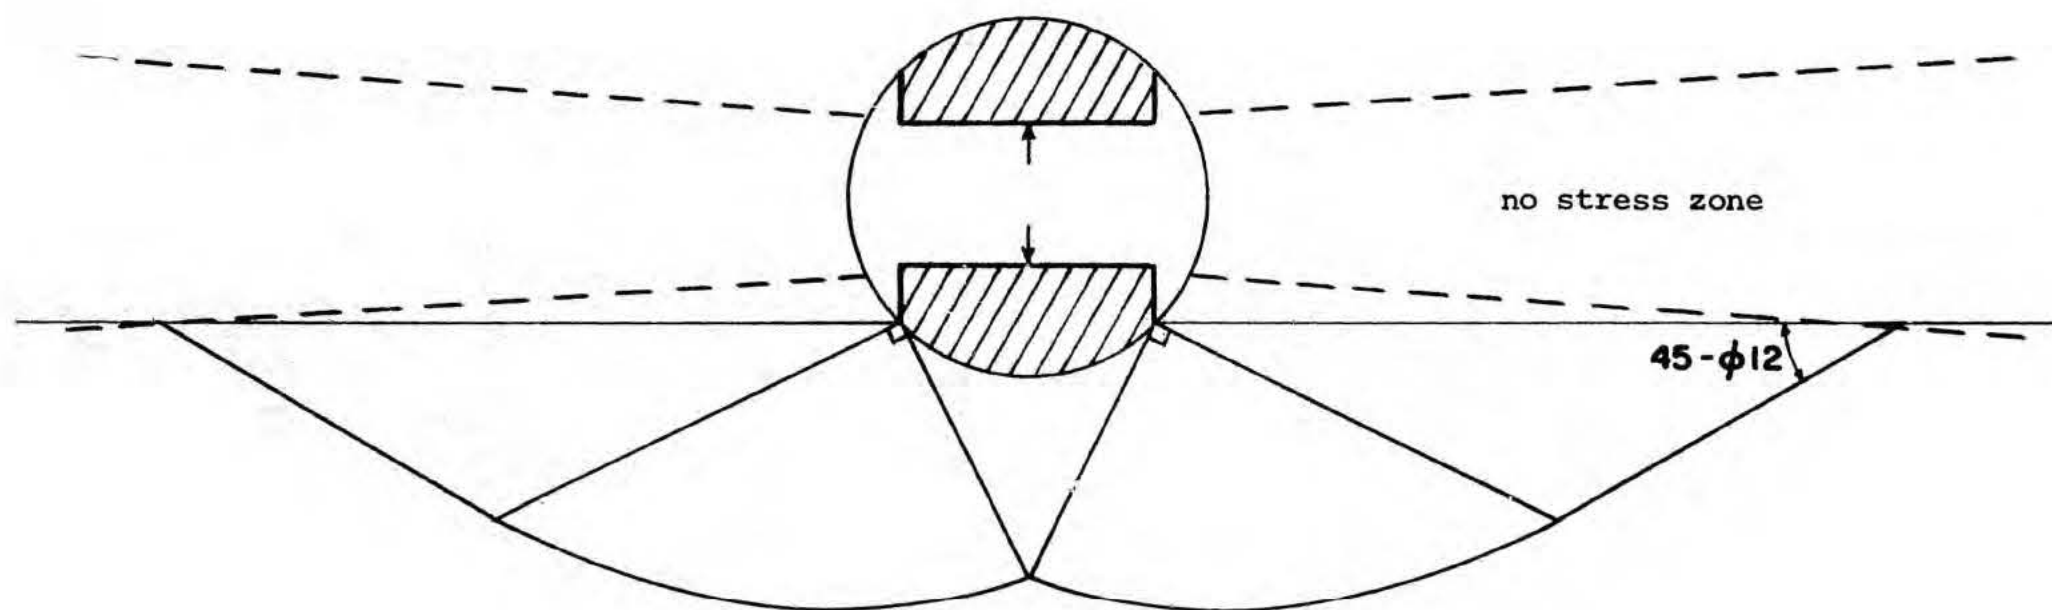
Failure mechanism for large bearing plate in expanding soil
